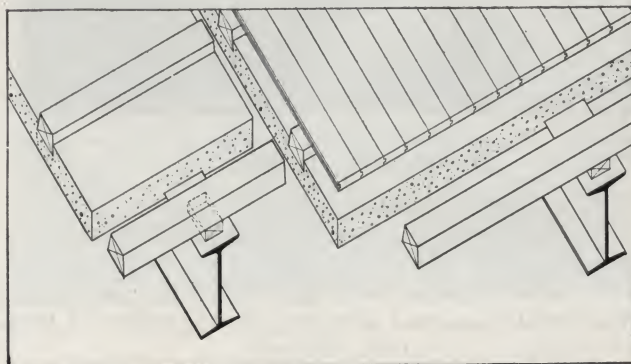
Diagram Showing Concrete Slab Floors Poured Over Removable Wood or Metal Forms
